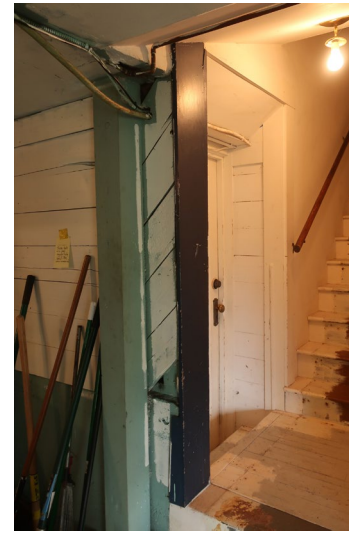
Detail of original diagonal wall sheathing beside door opening.
